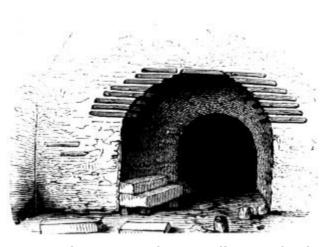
Culvert piercing the long wall at Knightrider Street (Observation 16). (Scale 6×1)
